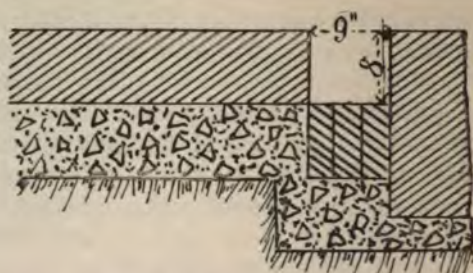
SECTION AT CROSSING SHOWING GUTTER PAVED WITH STONE BLOCKS.
